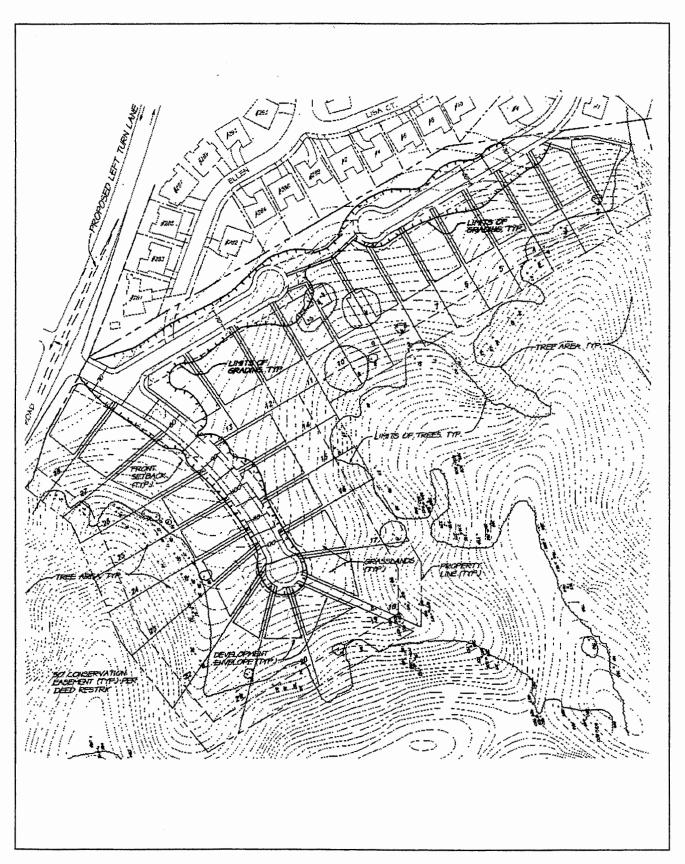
PROPOSED RESIDENTIAL BUILDING ENVELOPES Oakview Master Plan
